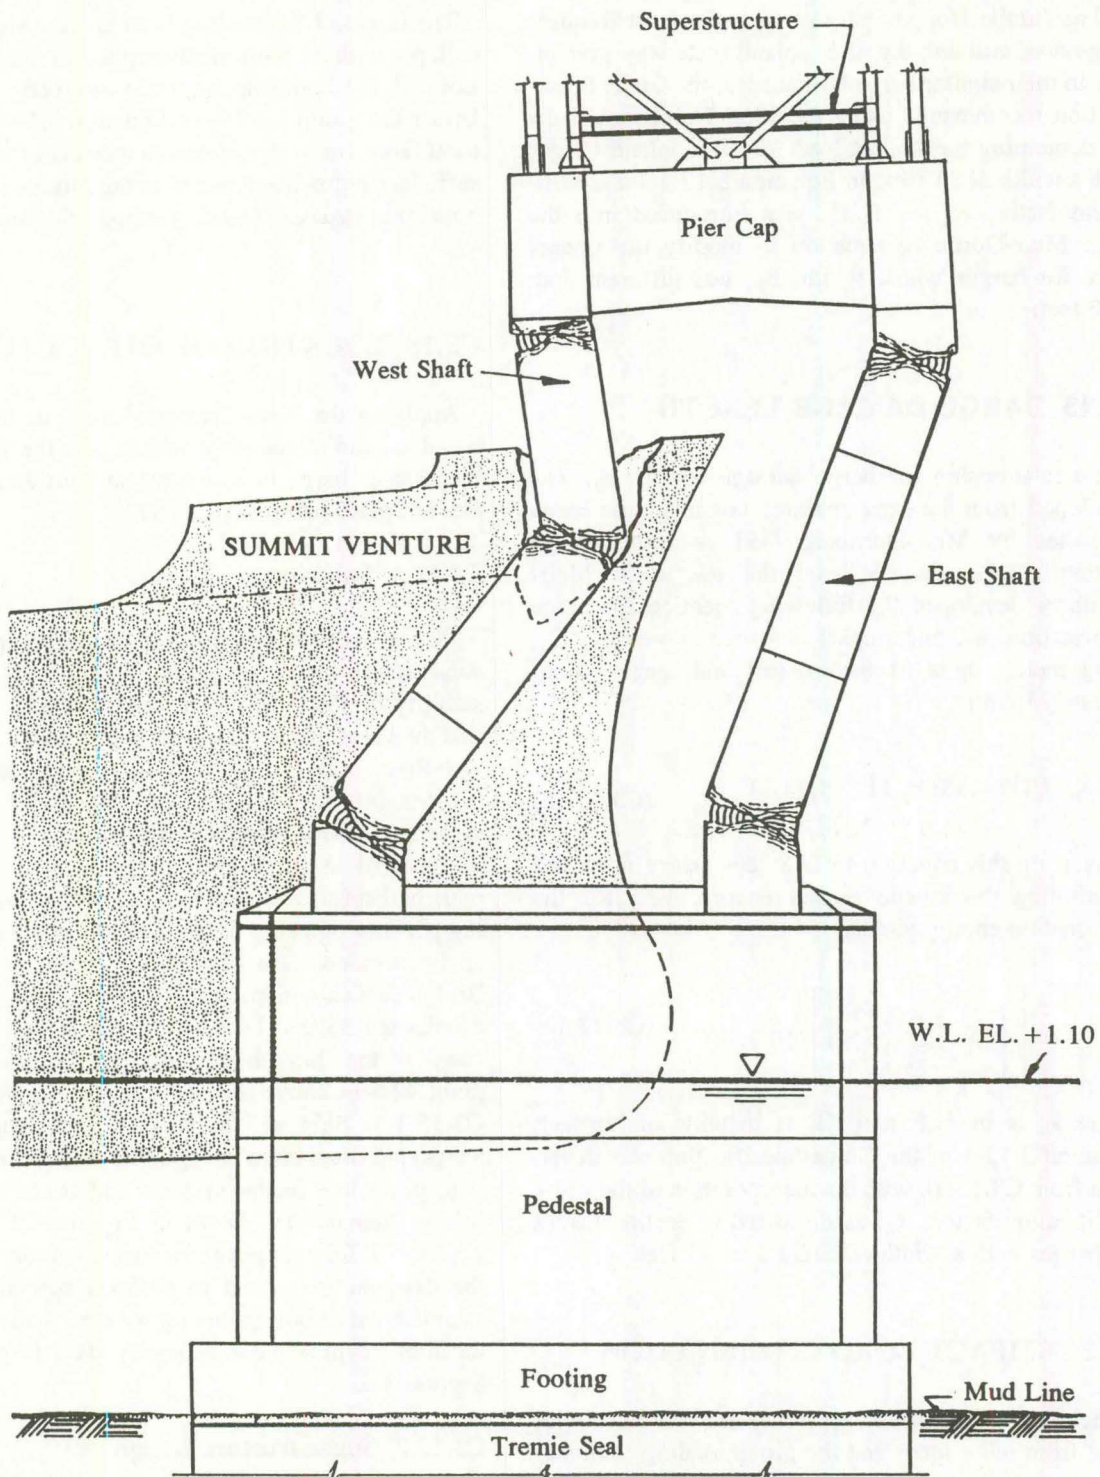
Collapse of Pier 2S of the Sunshine Skyway Bridge Subsequent to Impact by the Bow Overhang of the M/V Summit Venture, adapted from [22].
